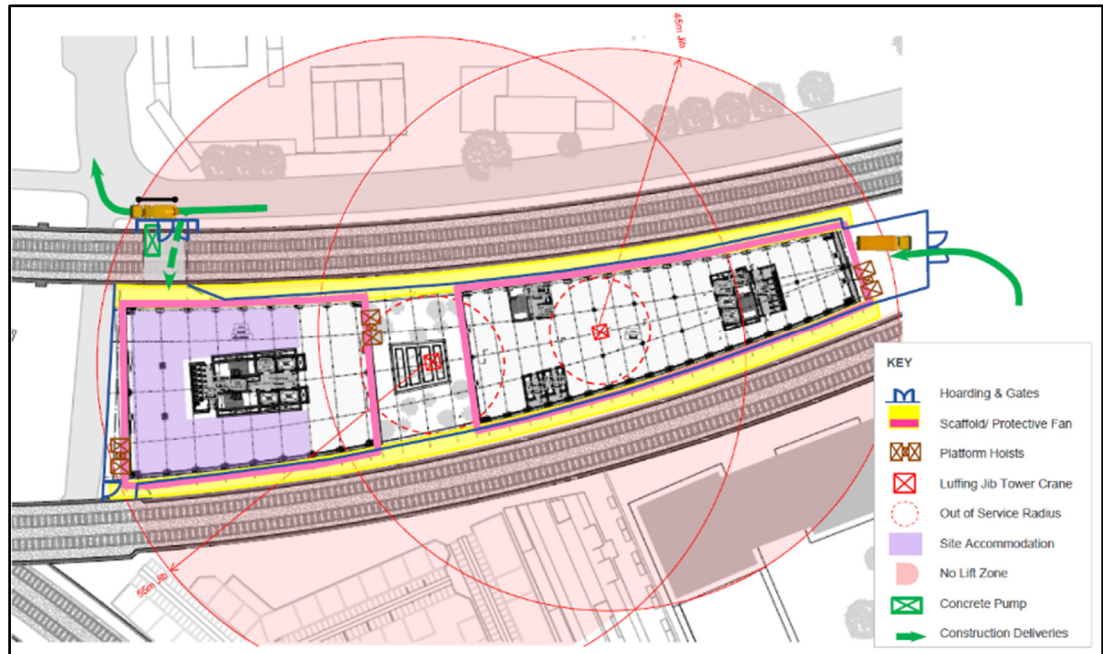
Superstructure Phase Construction Arrangement (Blue Sky Building Plan)
